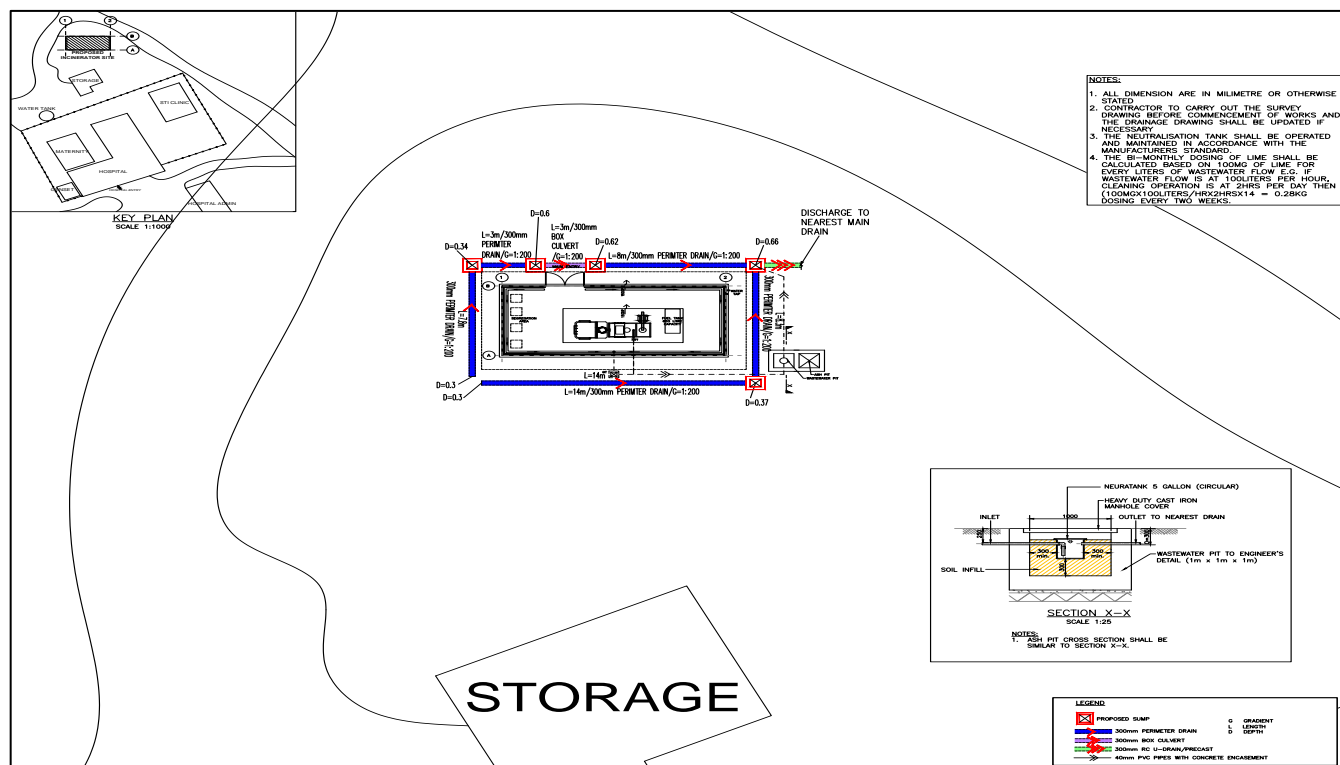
Site plan of the proposed healthcare waste management facility at Kwikila Provincial Hospital
